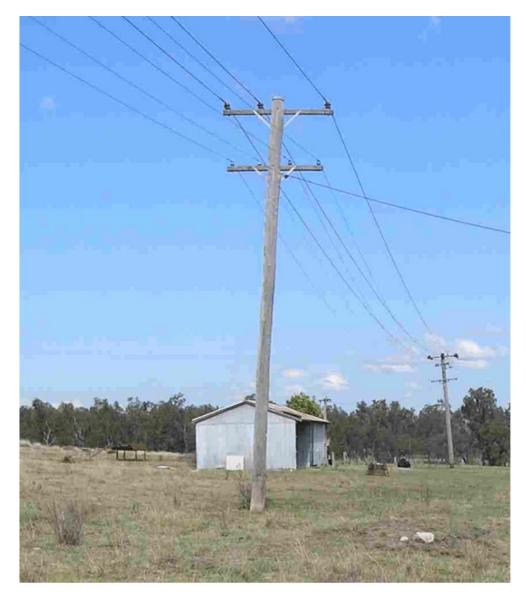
Local distribution power line supported on single pole structures at the northern end of Longwall 4.
